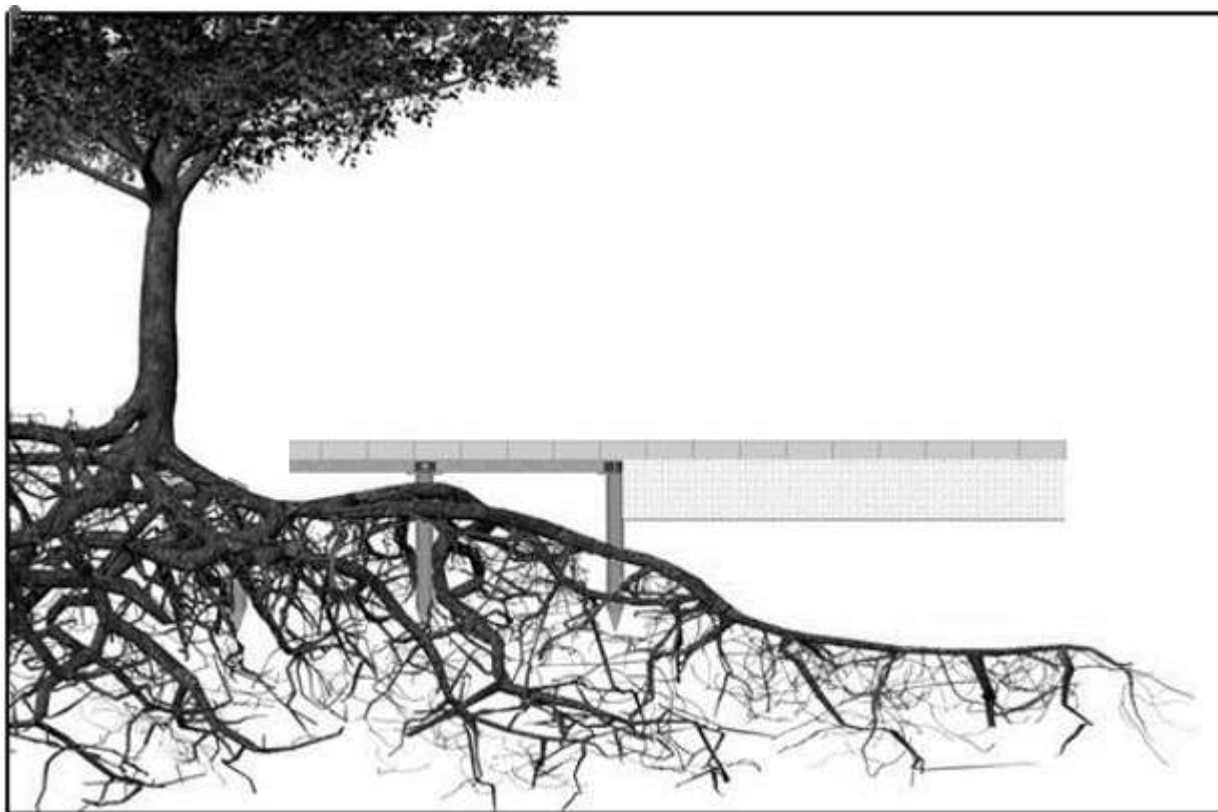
Example of a cantilevered and suspended building section (External Works, 2022).
